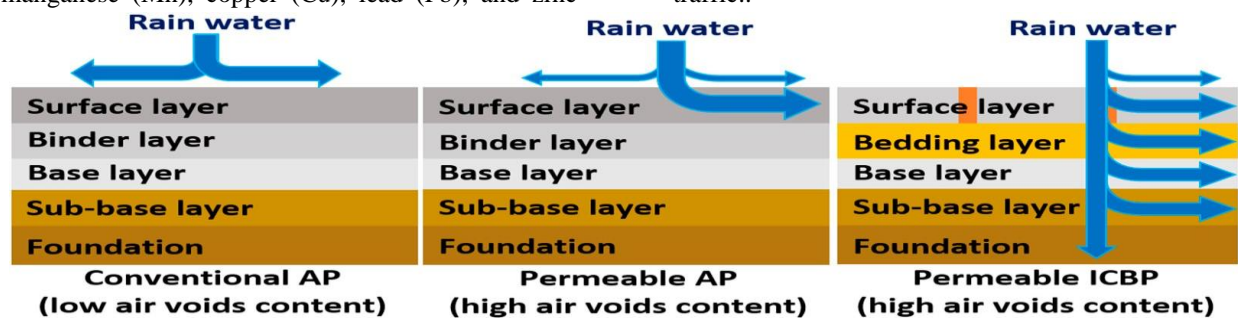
Mechanism of run-off infiltration in permeable pavement layers (adapted from [3,78]).
